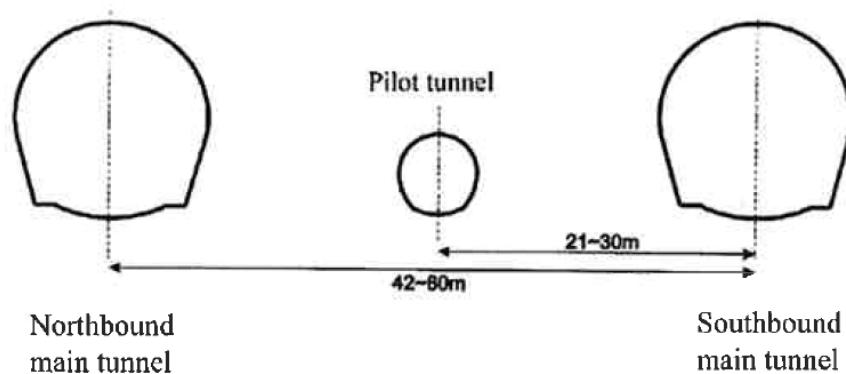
Cross-sectional layout of Xueshan Tunnel.
